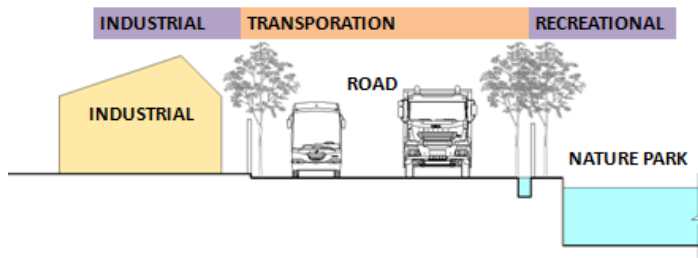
Section through Taratala Road & Nature Park (Source: Author)
